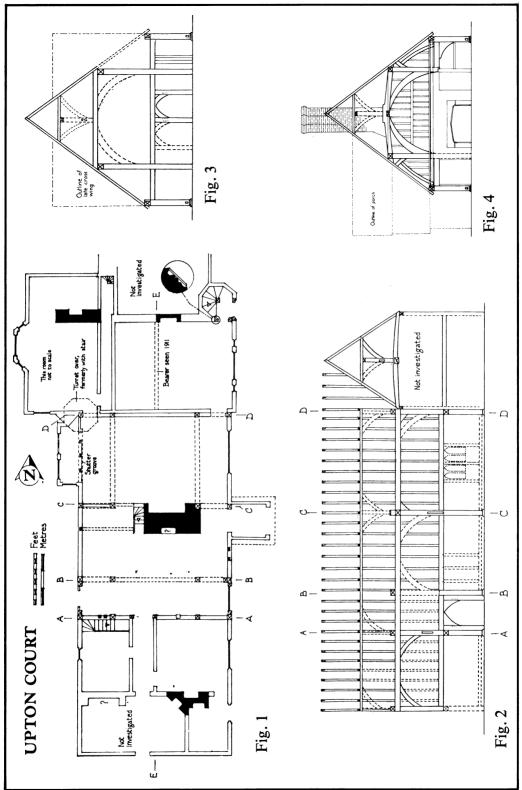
Section at A—A, looking south, showing doors into service rooms. Fig. 4. Section at C—C, looking south, showing central truss of hall omitting post-medieval features. Fig. 2. Longitudinal section (cut-away view) at E—E, looking west. Fig. 1. Ground plan.
